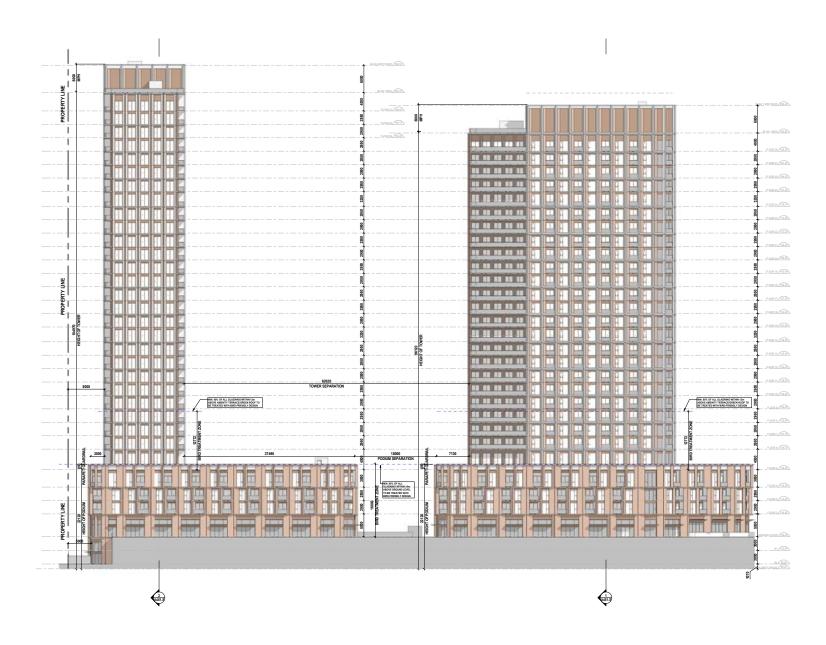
BUILDINGS 1 & 2 NORTH ELEVATION (BDP. QUADRANGLE ARCHITECTS LTD.)
